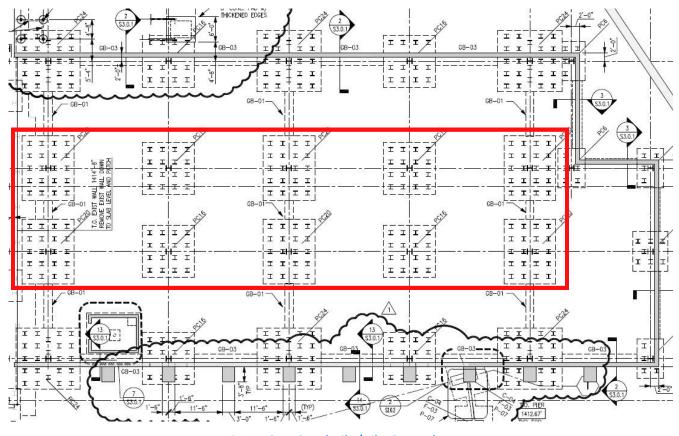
Steel Pile/Pile Caps Plan Drawings Courtesy of JCJ Architecture
